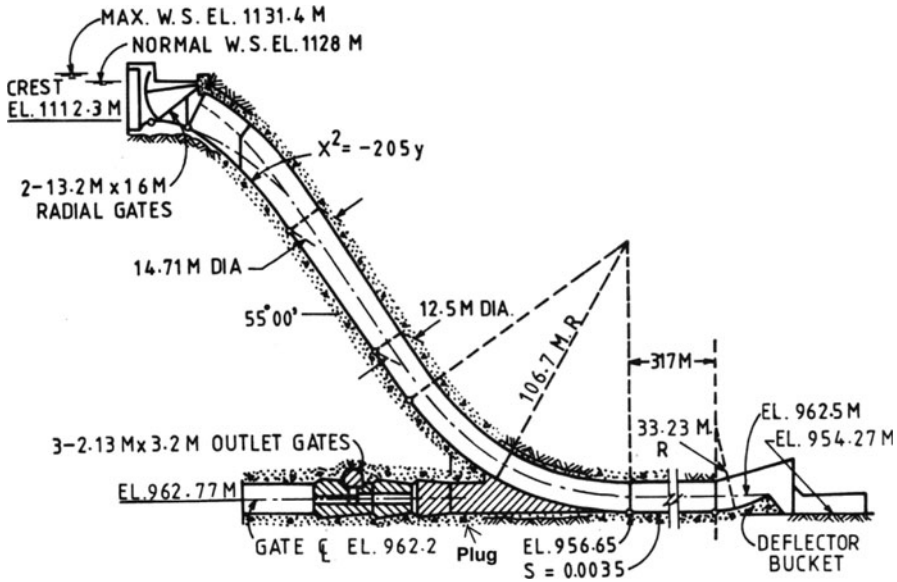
Glen Canyon dam – Profile of left spillway and tunnel plug.
